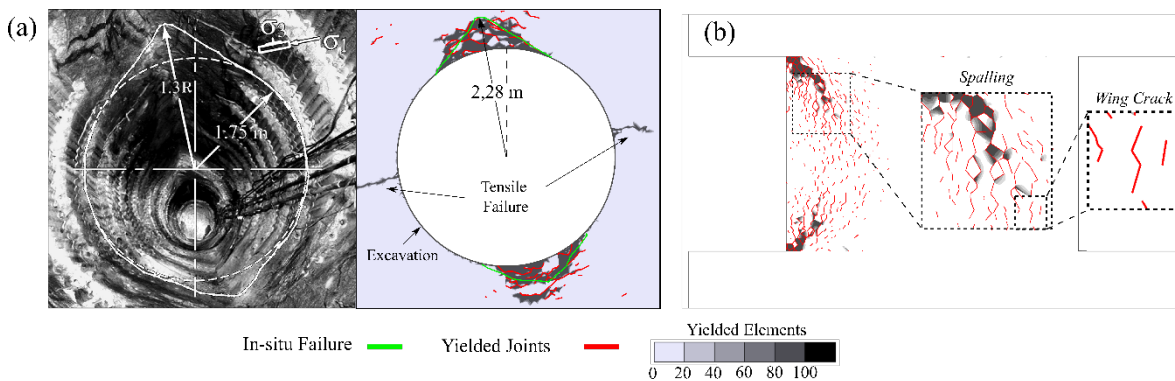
The spalling process demonstrated through yielded elements and joints: (a) tunnel and (b) pillar.
